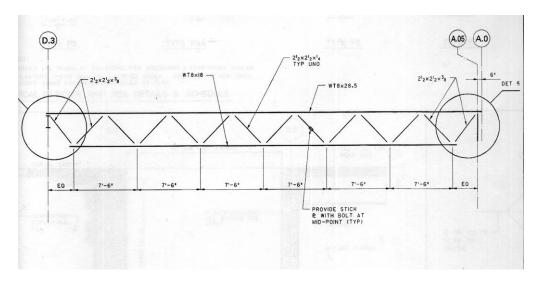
Open Web Steel Joist Elevation n.t.s.
